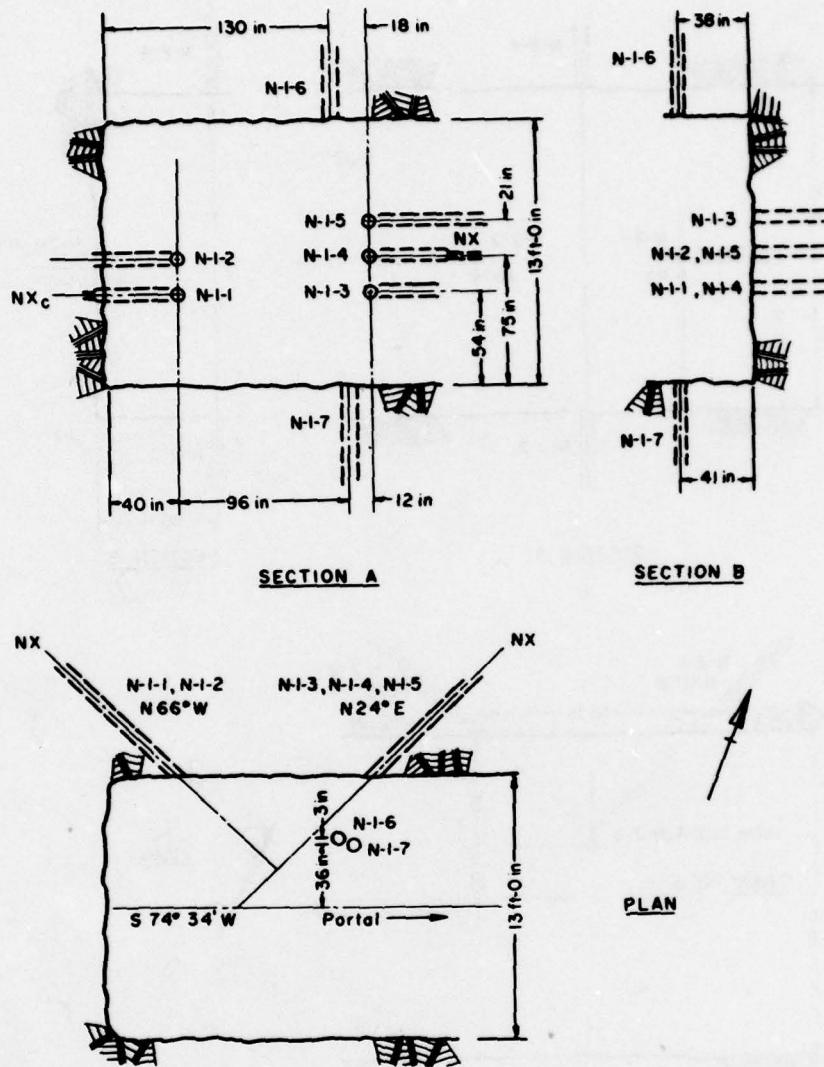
Detail plan and section of site 1 -- tunnel N -
